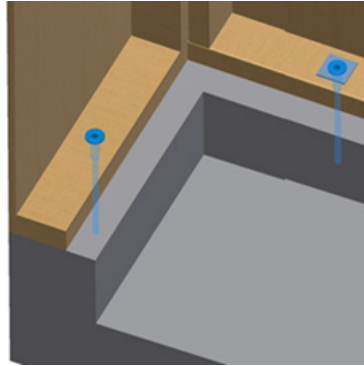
Sill Plate Anchor Installation in Concrete Curb
